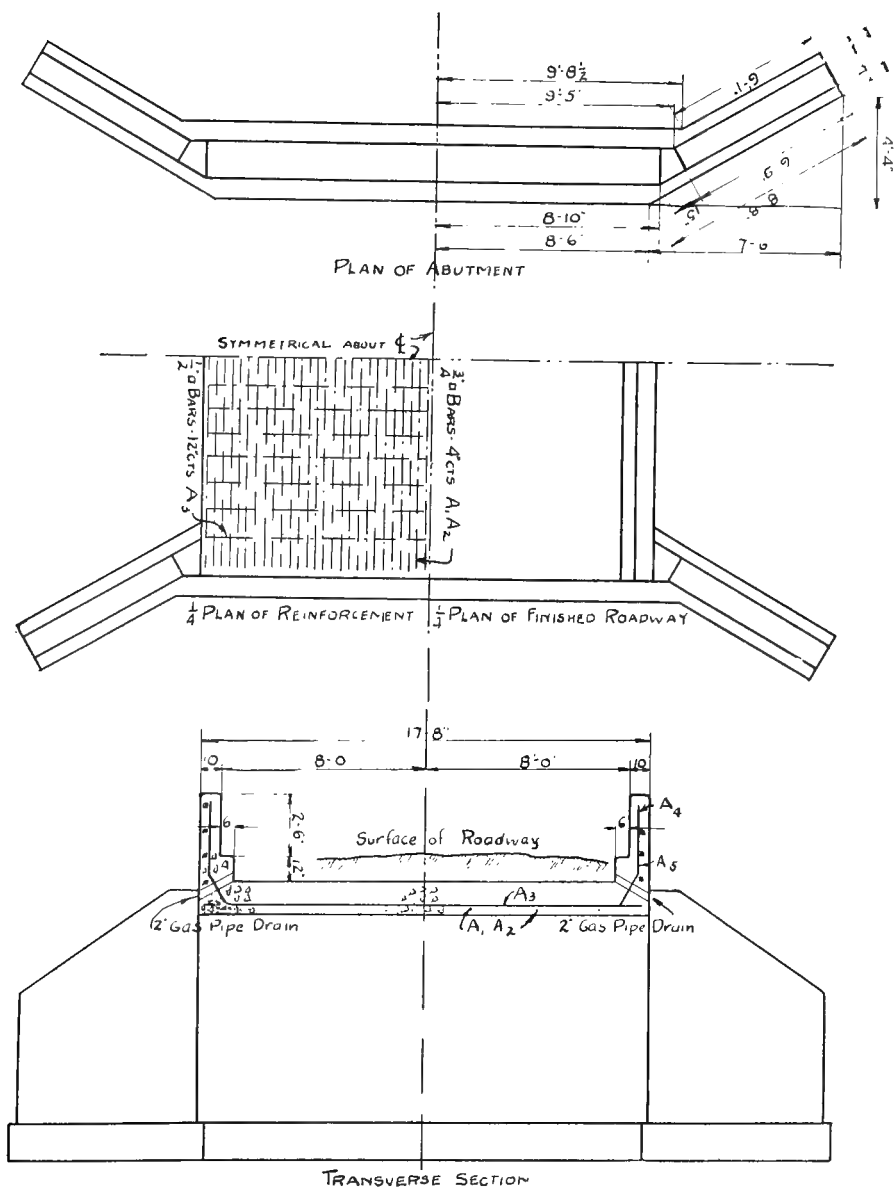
Concrete Bridge of 14-foot span and 16-foot roadway. Designed by the Wisconsin State Highway Commission.
